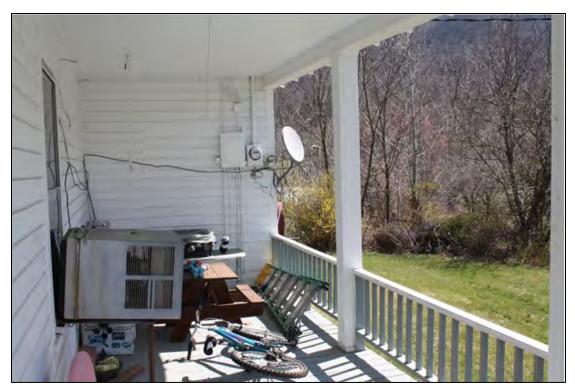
Looking north on the front porch. An area of patched siding can be seen on the far wall where a door was once present.
